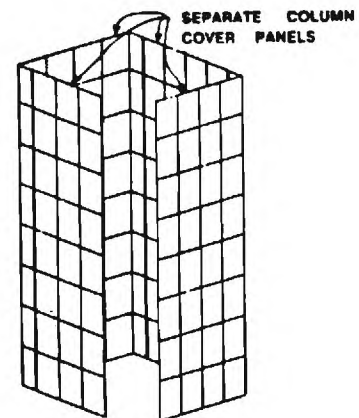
Cracked Column Cover Panels for Mexican Case Study Building
